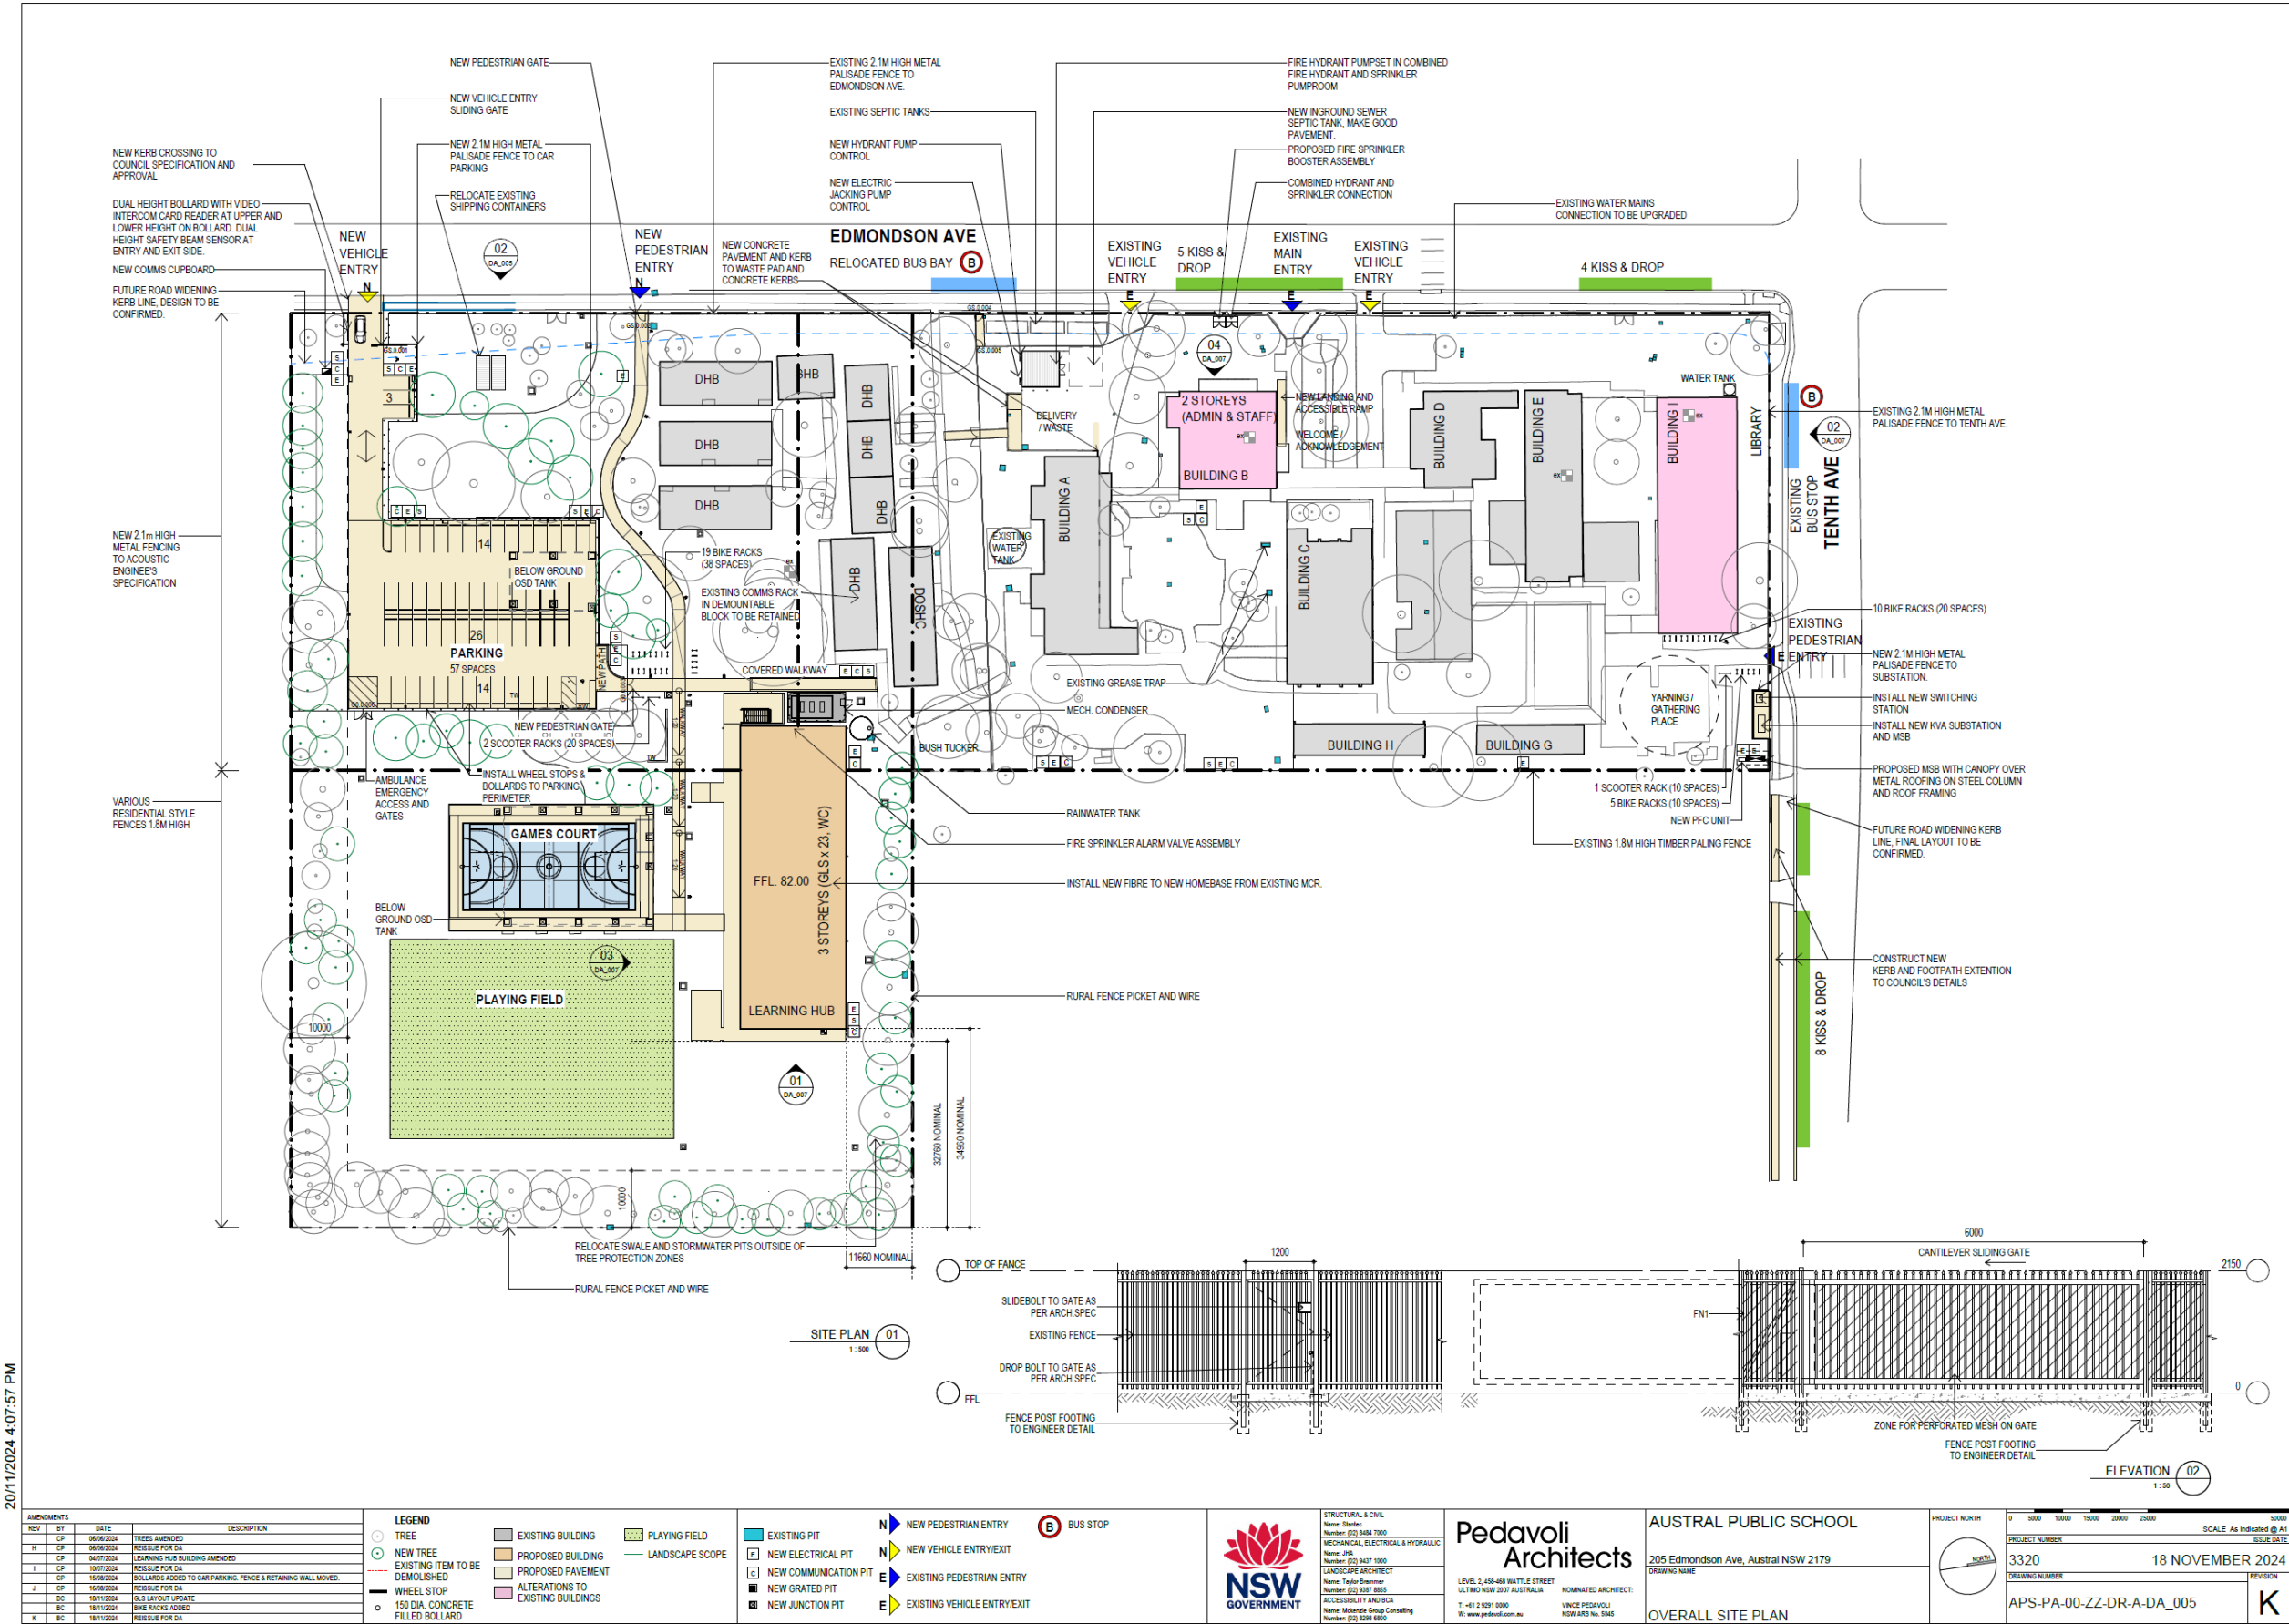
Proposed Site Plan (Pedavoli Architects, Overall Site Plan, Rev K)
